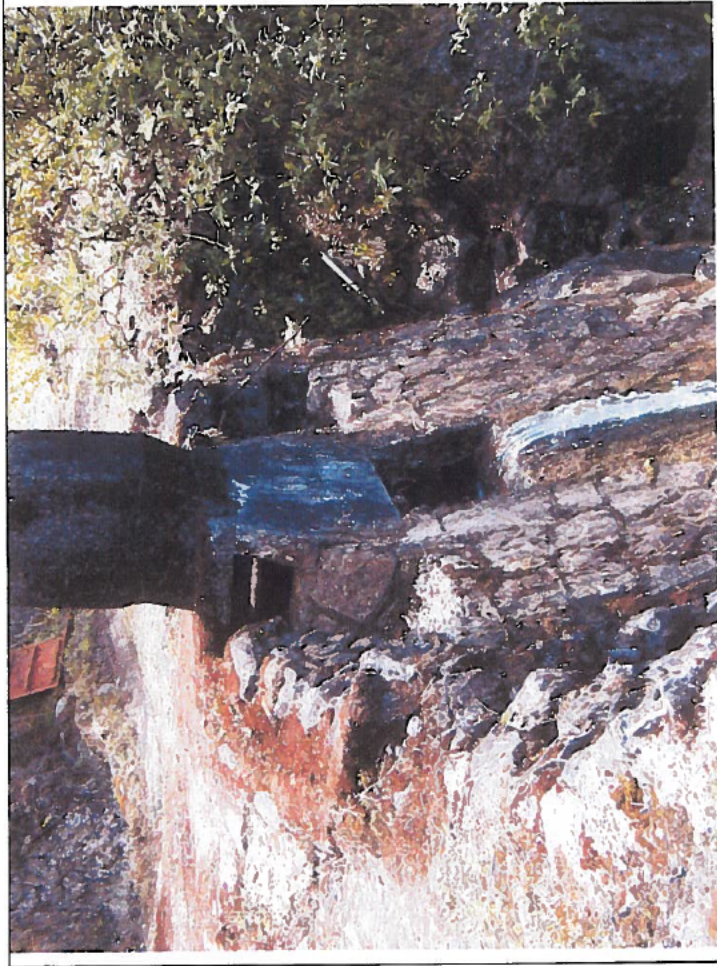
4-inch pipe east of #11 intake at Koolau Ditch (K-23a)
